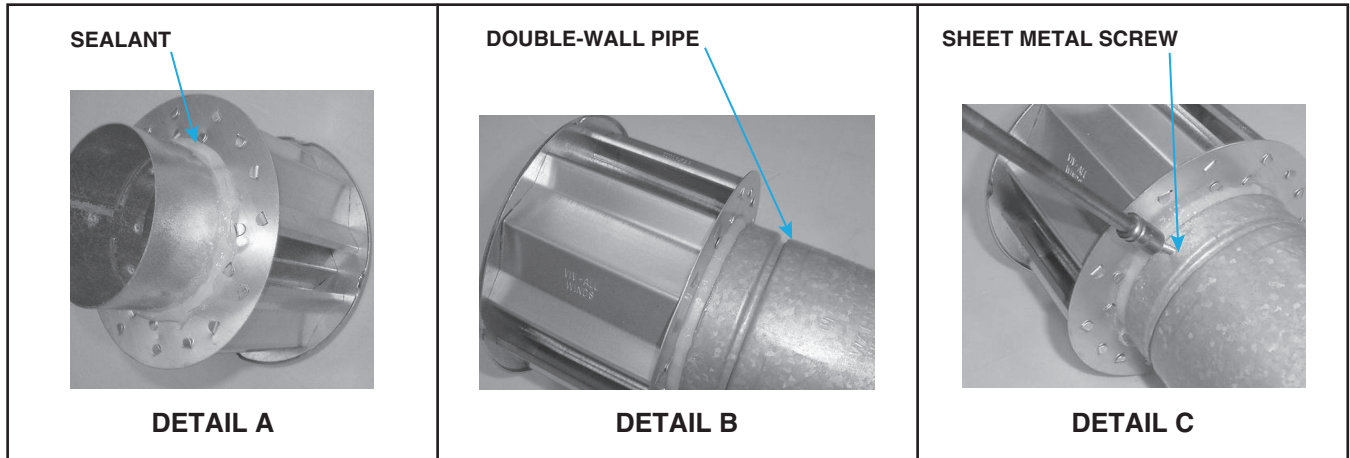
Connecting Double-Wall (Type B) Pipe to Vent Cap
